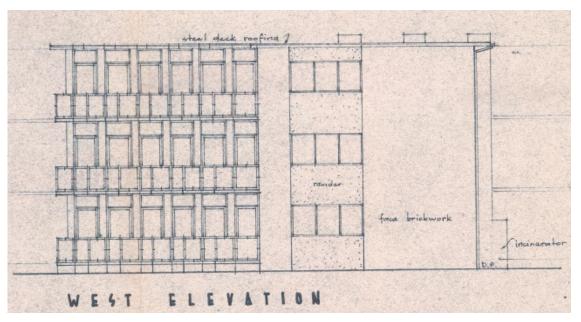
1960 drawings, front or west elevation (Source: Building File)
